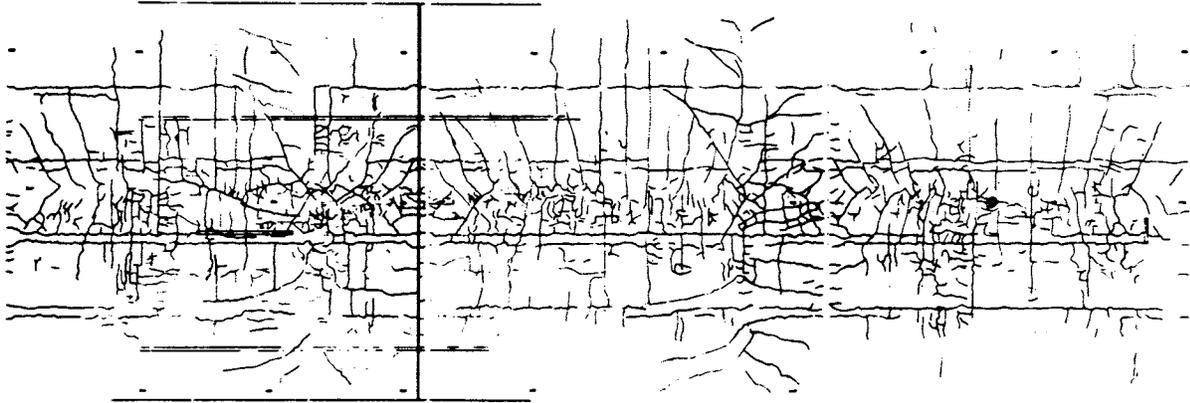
Plan view of cracks in deck of Rte. 64 bridge over Rte. 639.
